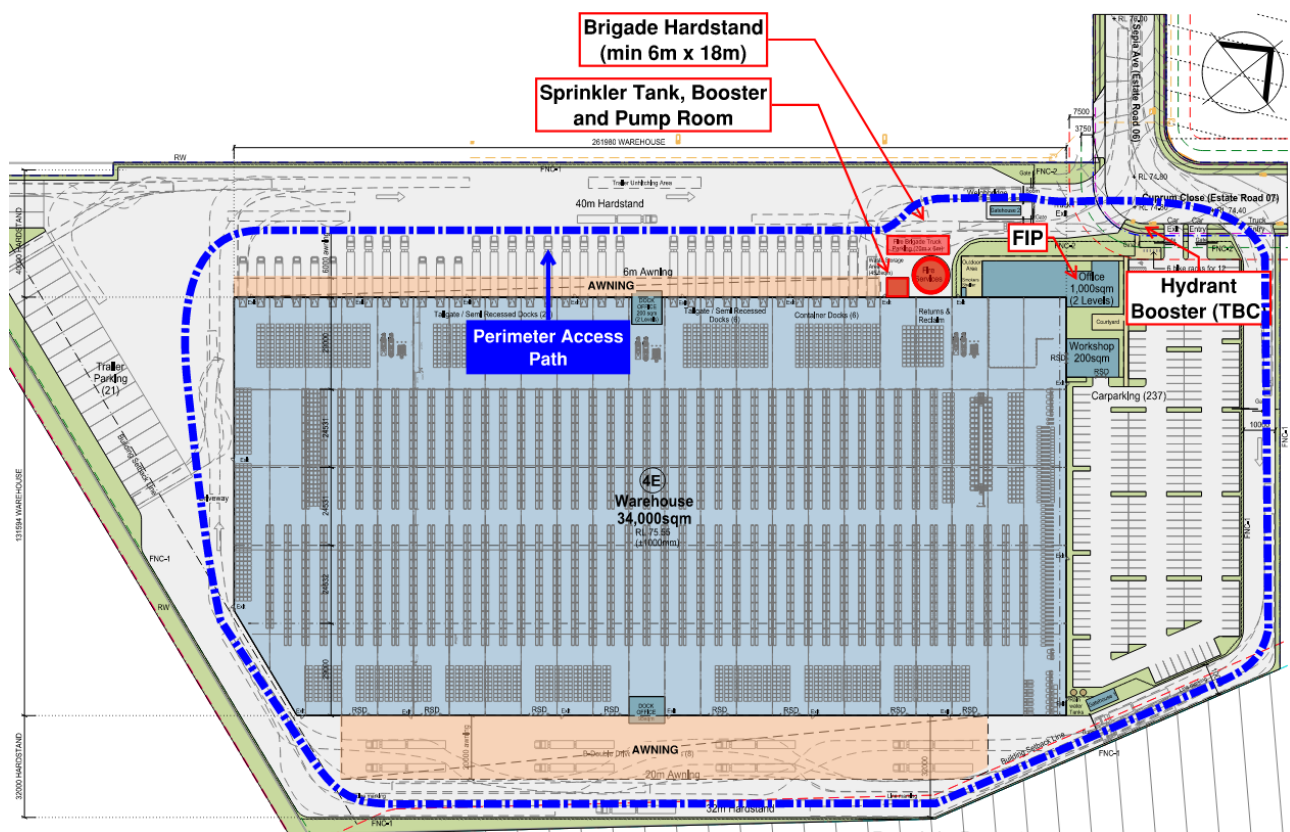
Fire Brigade Access and Sprinkler Booster Hardstand
